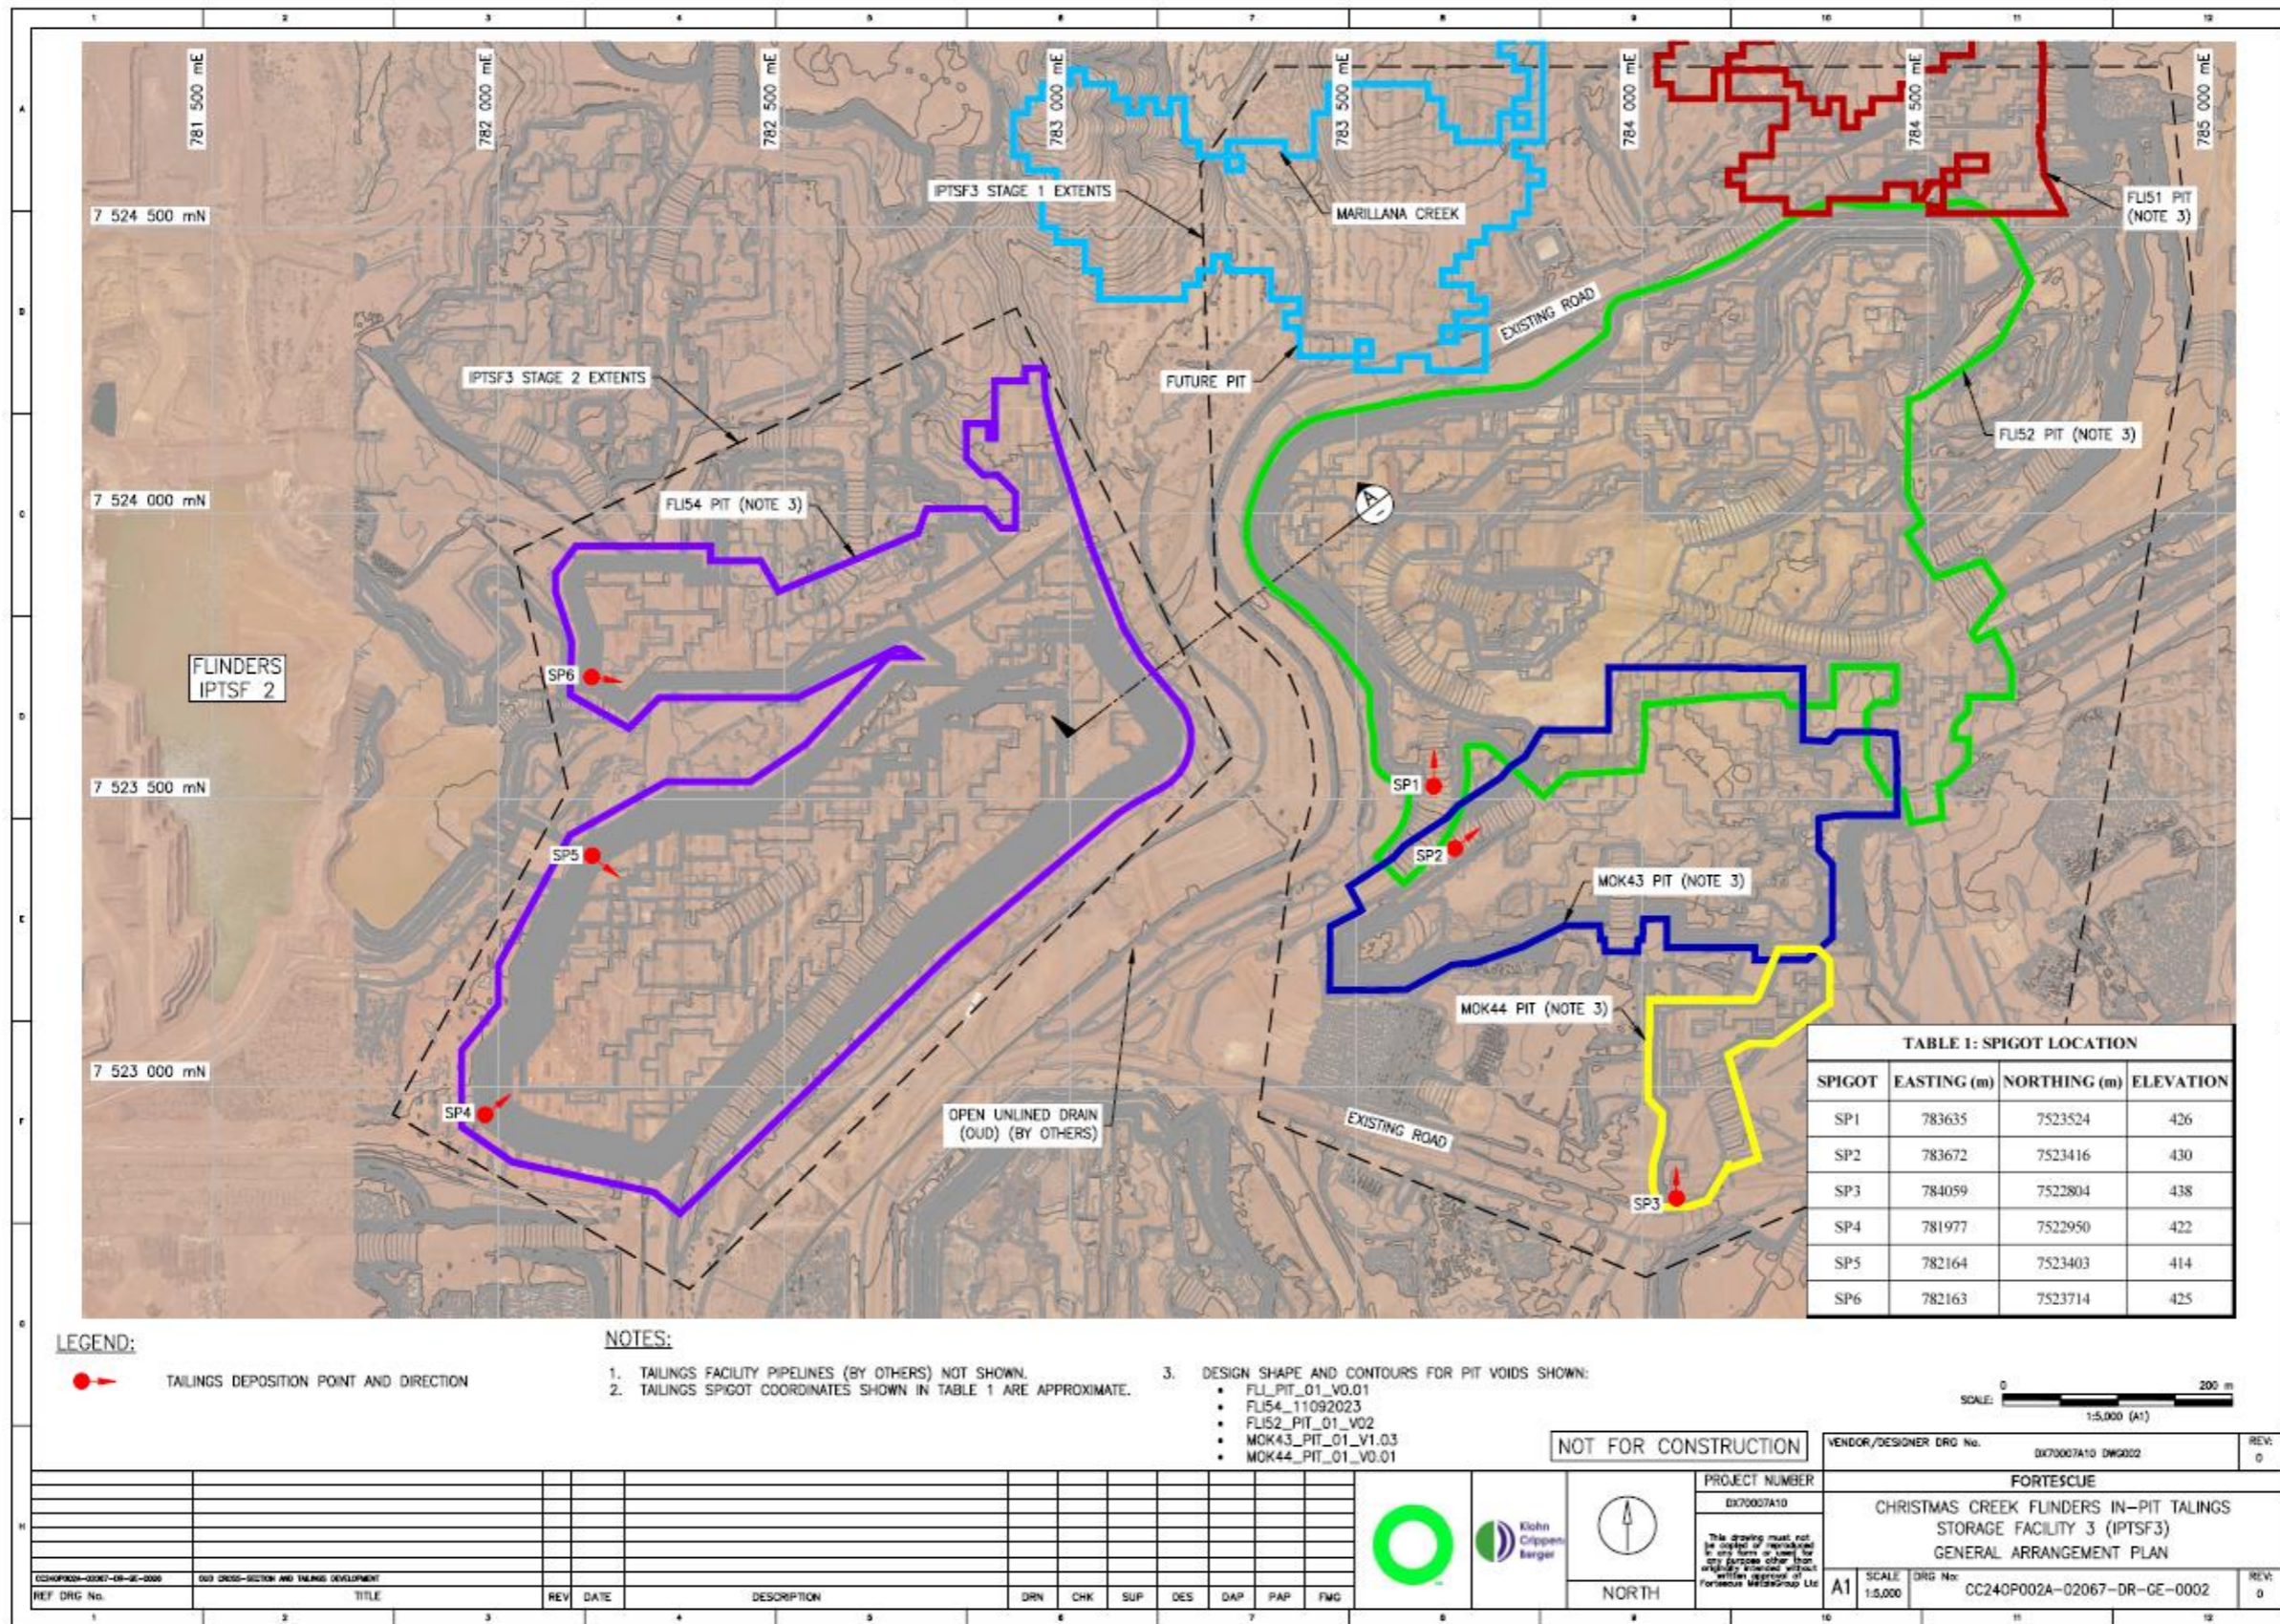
Flinders In-Pit TSF3 General arrangement plan including indicative tailings deposition locations
